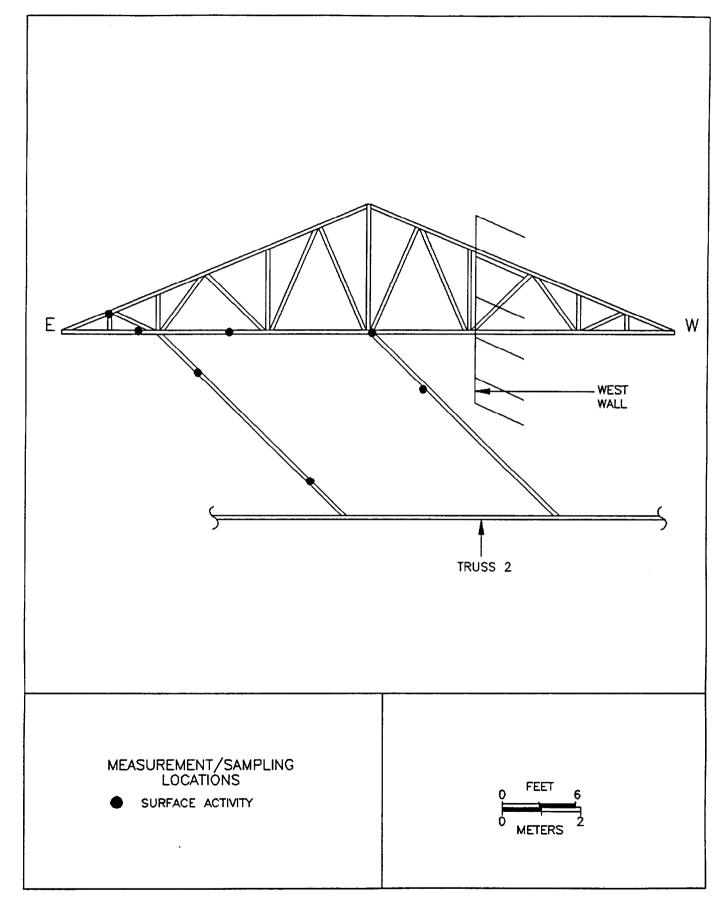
Building 8, Truss 3 — Measurement and Sampling Locations
